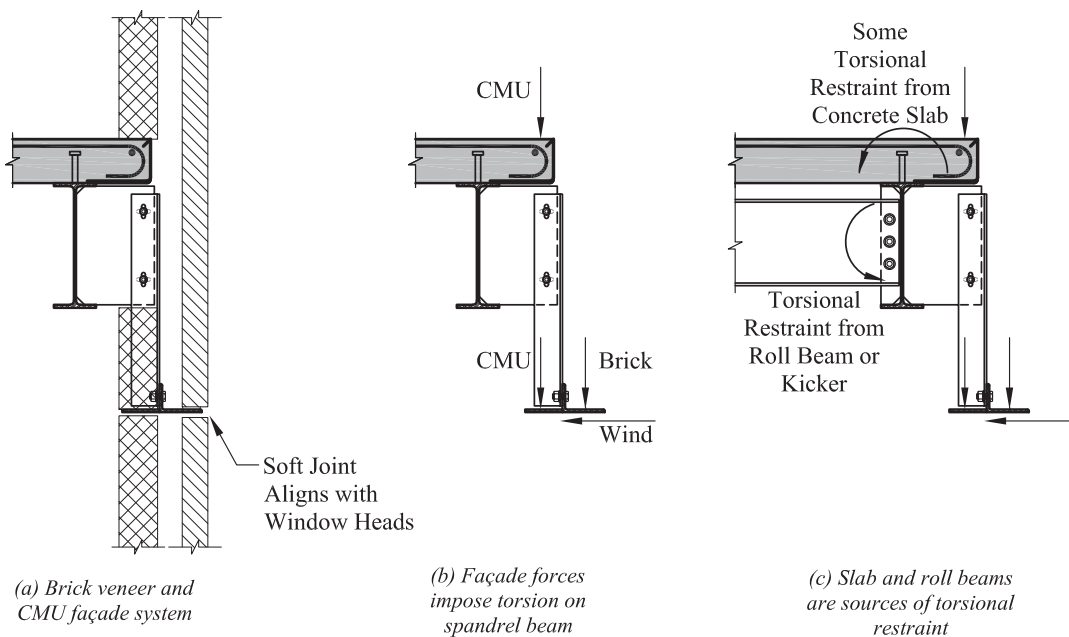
Example detail that induces torsion on spandrel beam.
